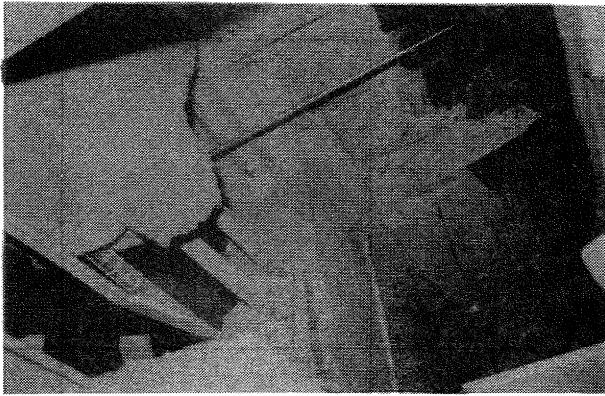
SHEAR FAILURE OF TYPICAL COUPLING GIRDER
